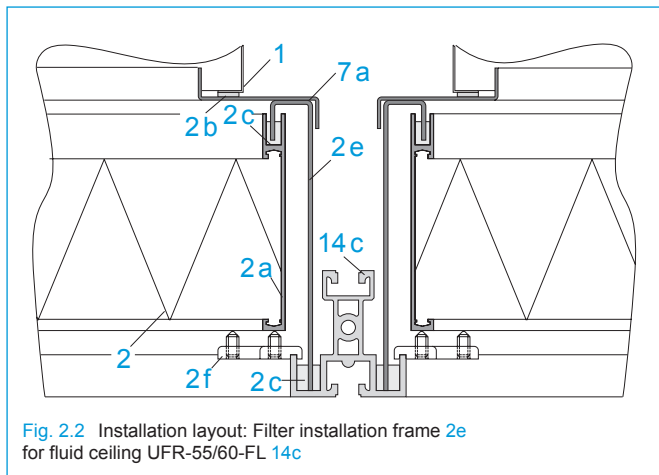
Installation layout: Filter installation frame 2e for fluid ceiling UFR-55/60-FL 14c
